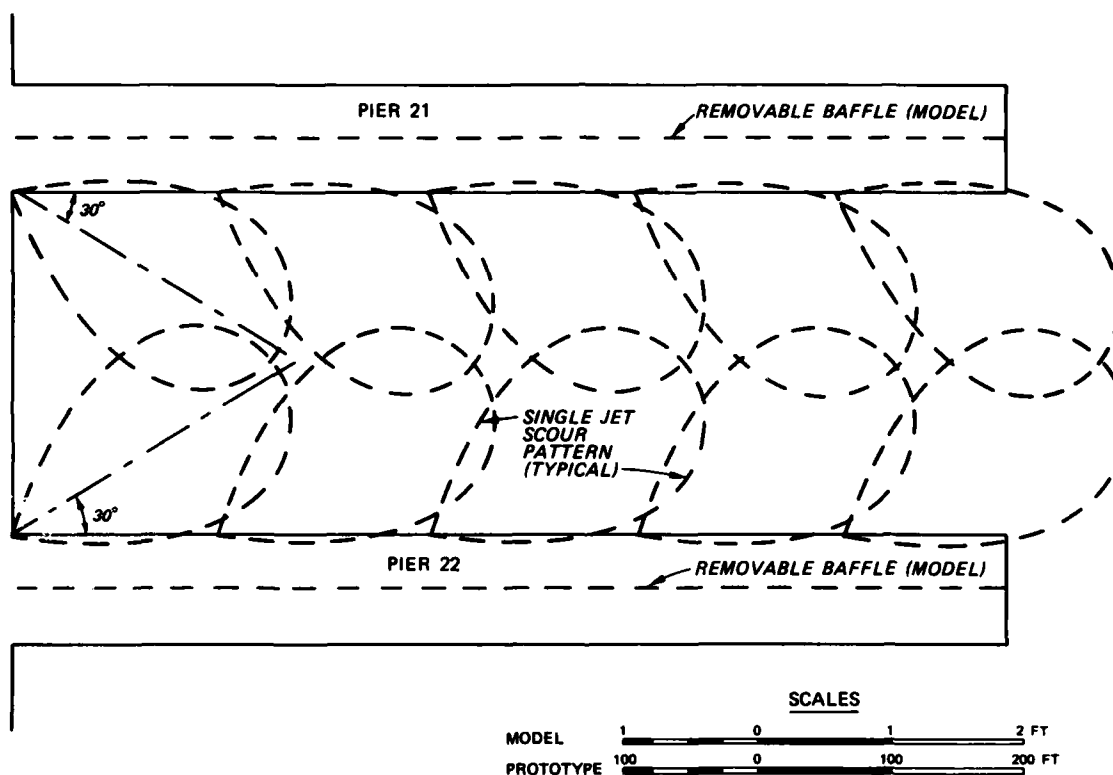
Scour jet array model layout, Piers 21 and 22, Mare Island
